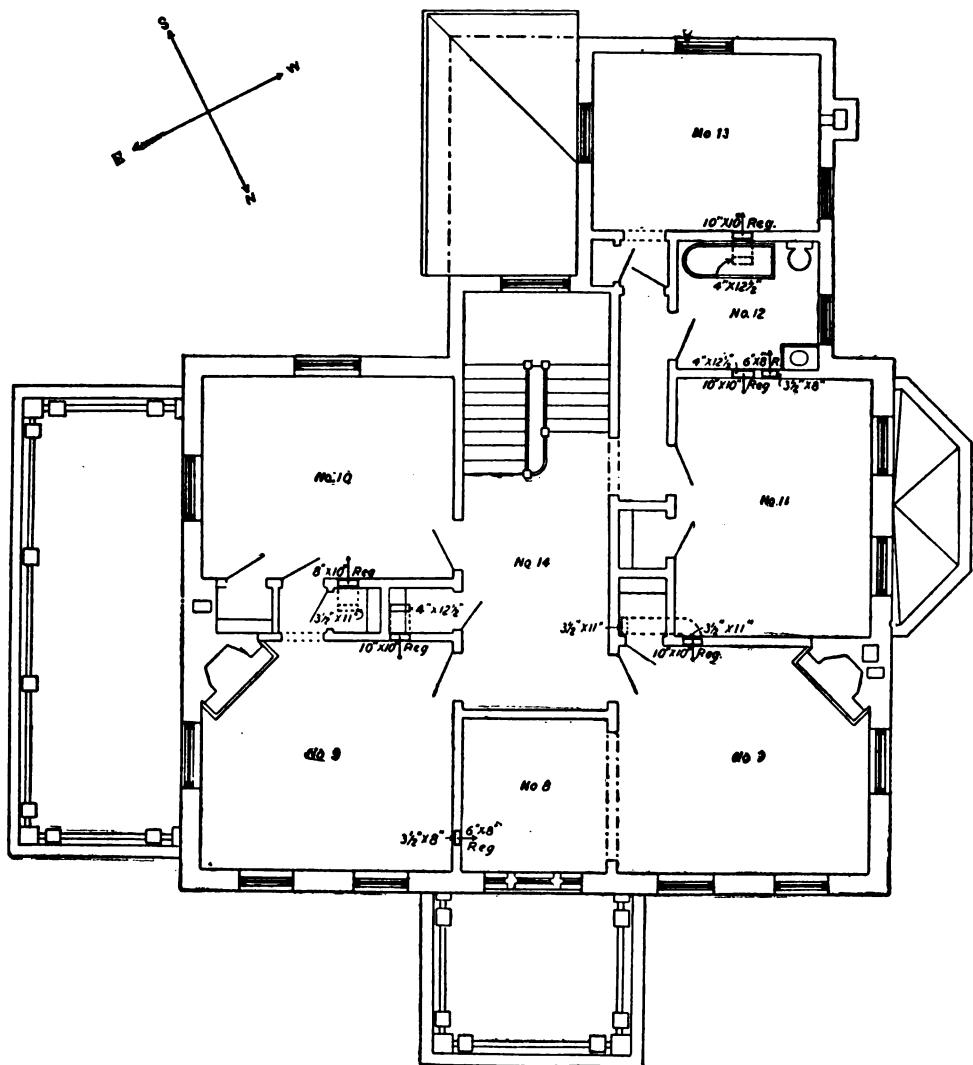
Second Floor Plan, Showing Sizes of Flues and Registers.
